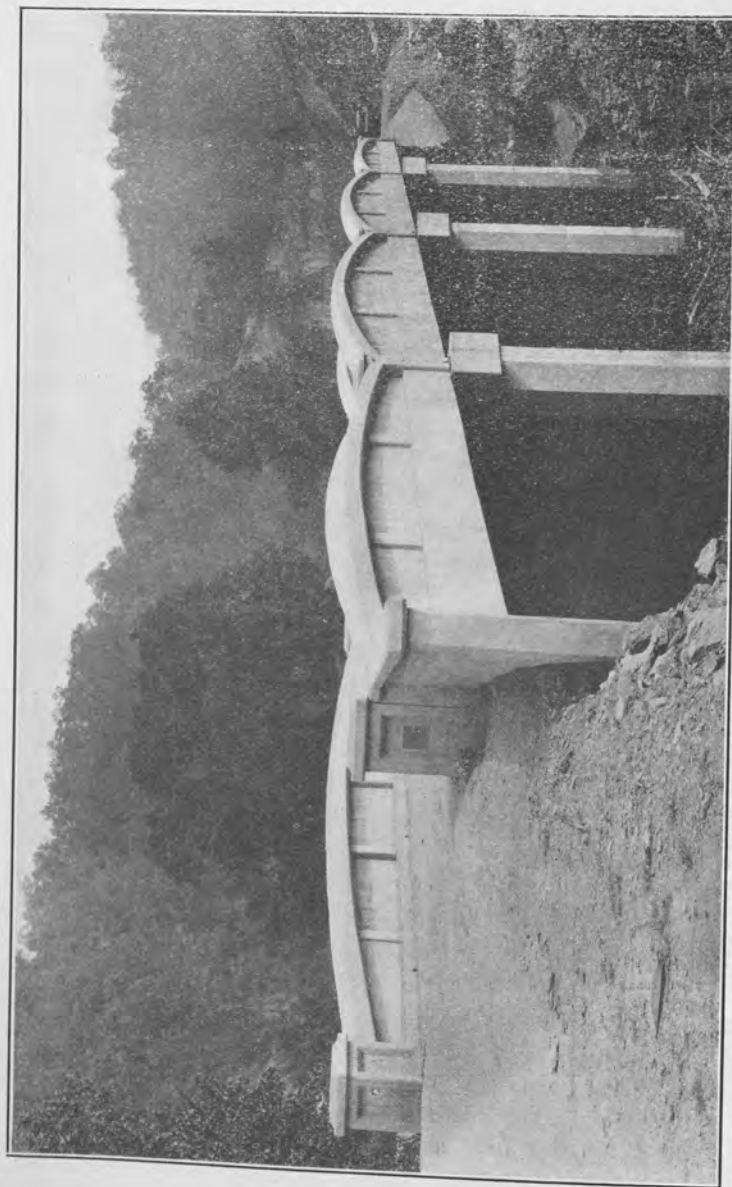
CEMENT IN BRIDGE CONSTRUCTION
